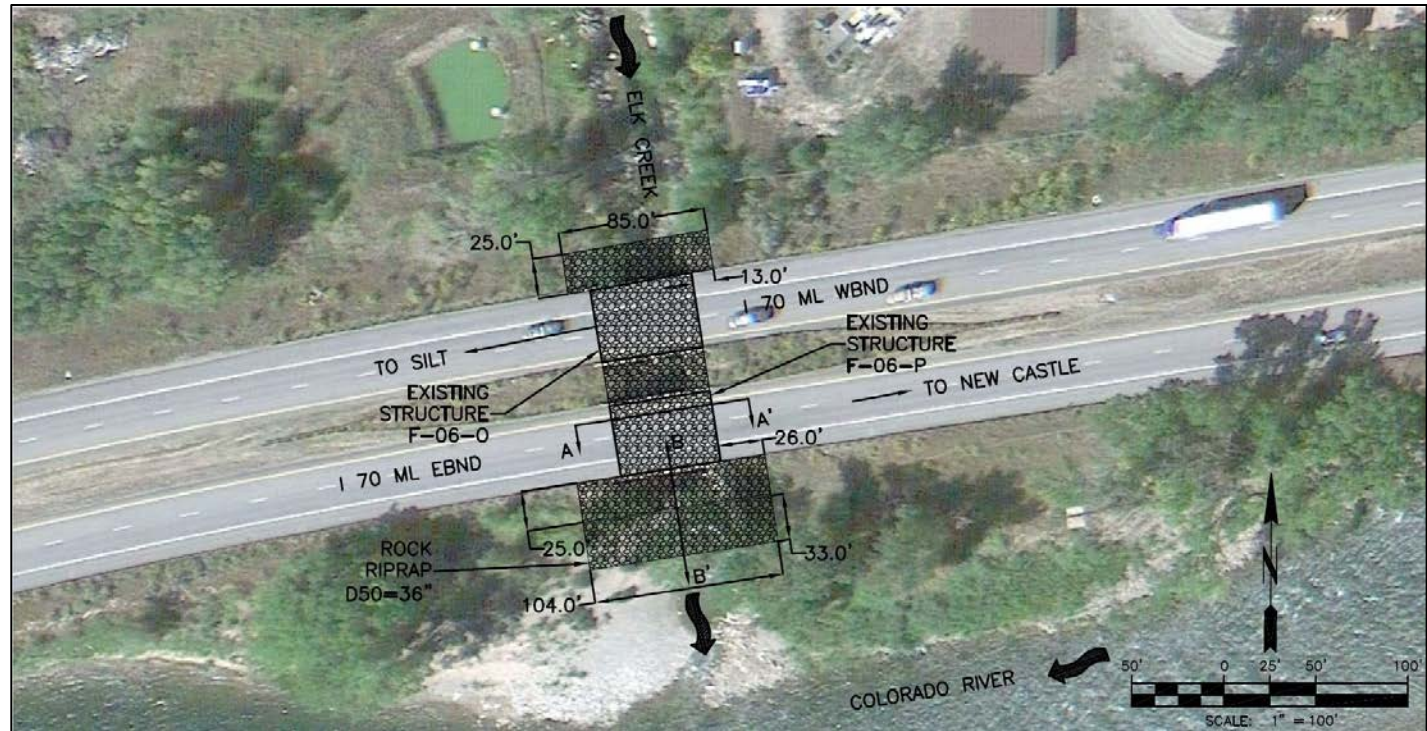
Plan view of Bridges F-06-O and F-06-P with recommended hydraulic scour countermeasure locations
